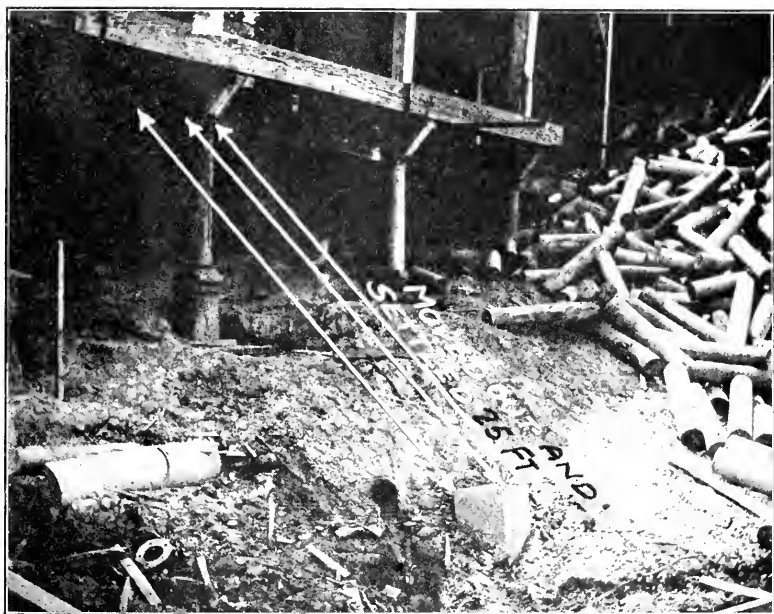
CONCRETE FOOTINGS UNDER WEST END OF STORAGE SHED.
